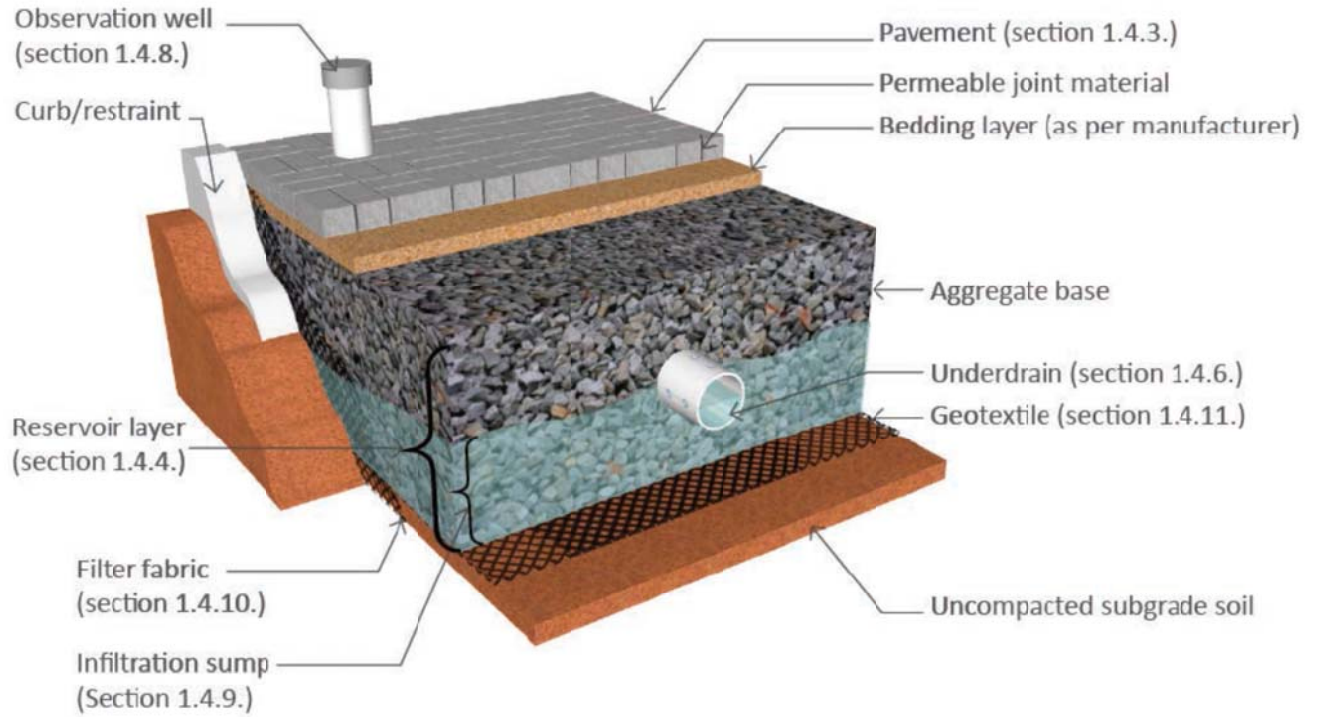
Schematic Profile of Permeable Pavement (Source: TDEC, 2014)
